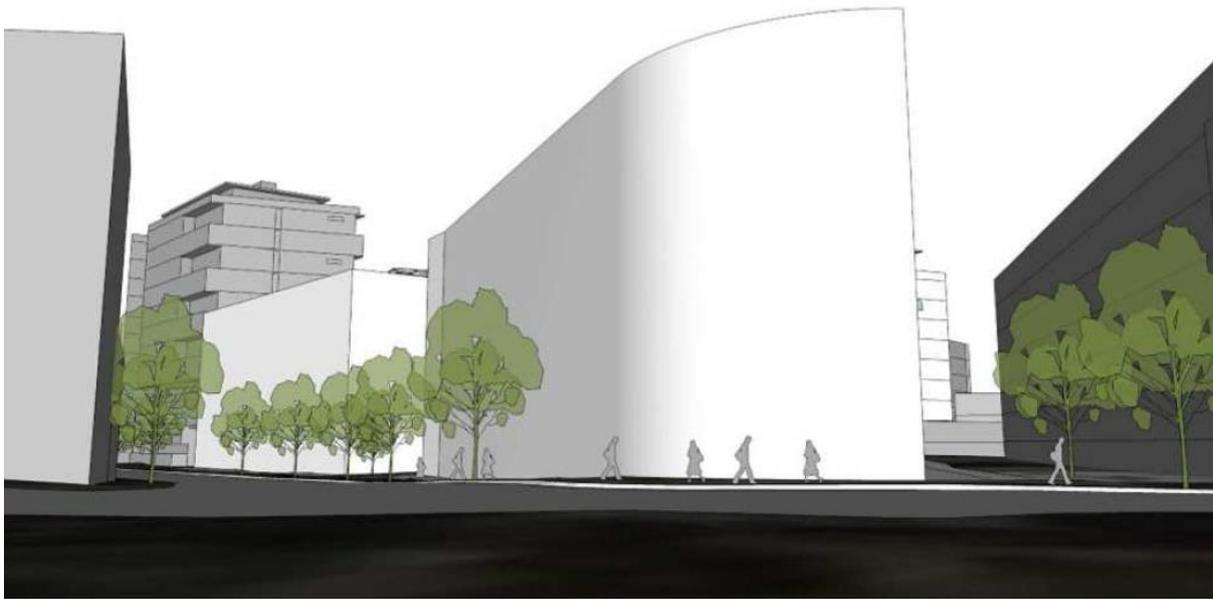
Envelope 3D view of the envelopes looking east at corner of Bourke Street and O'Dea Avenue
